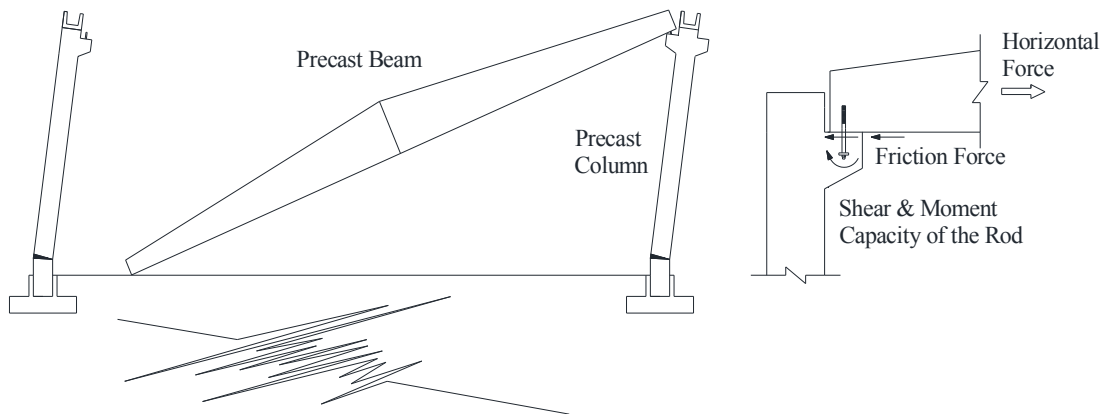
Graphical demonstration of shear failure of a precast concrete structure (Şenel, *et al.*, 2013).
